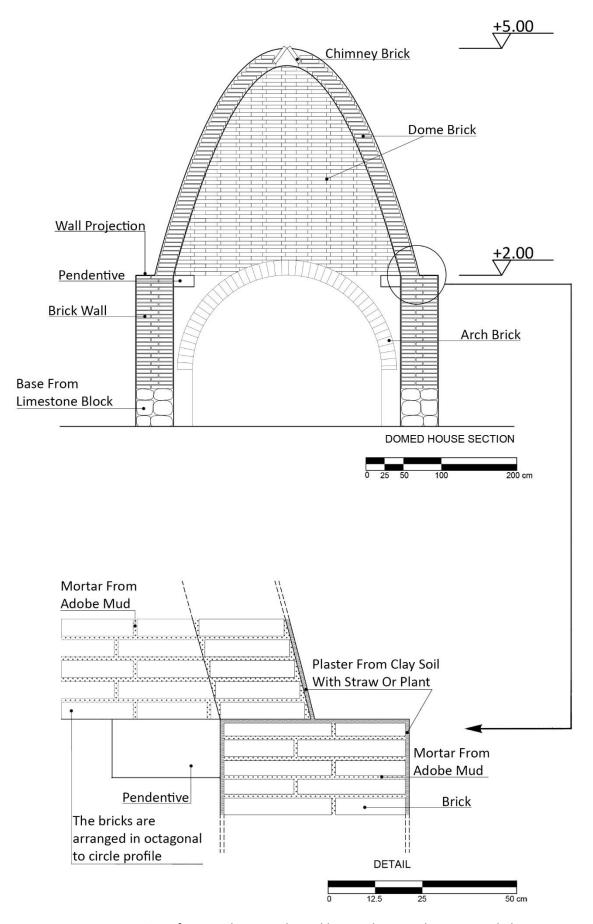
Section of a typical Harran domed house showing the structural elements and detail showing the mortar between the bricks and plaster of the exterior structure (2025).
